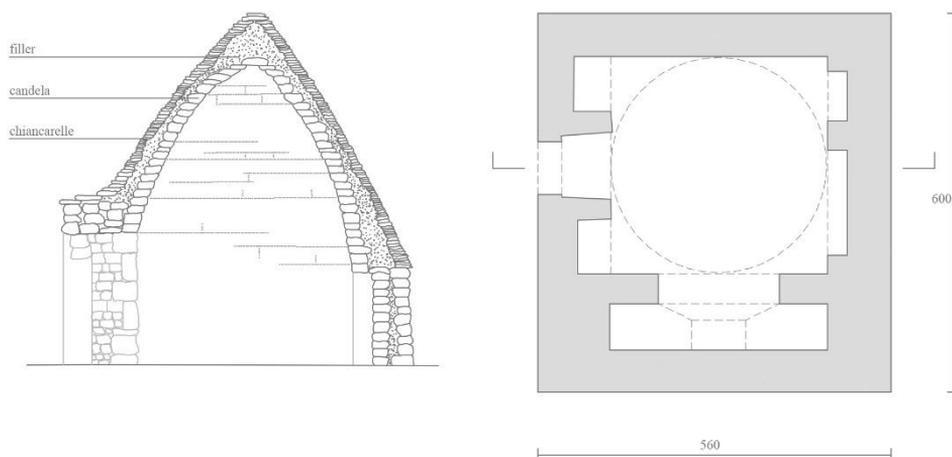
Section [15] and plan of case study *Trullo* in Alberobello
